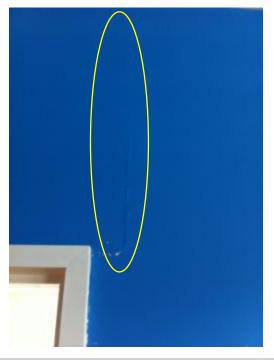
Vertical Crack at Wall Lining Joint on East Wall of Mid-Height Stair Landing
